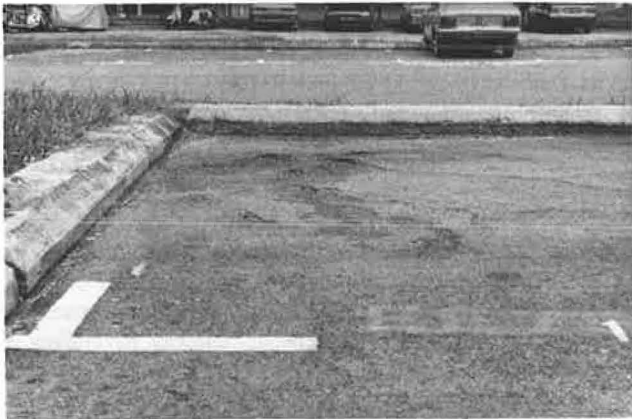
Asphalt pavement damaged by tree-root heaving.
